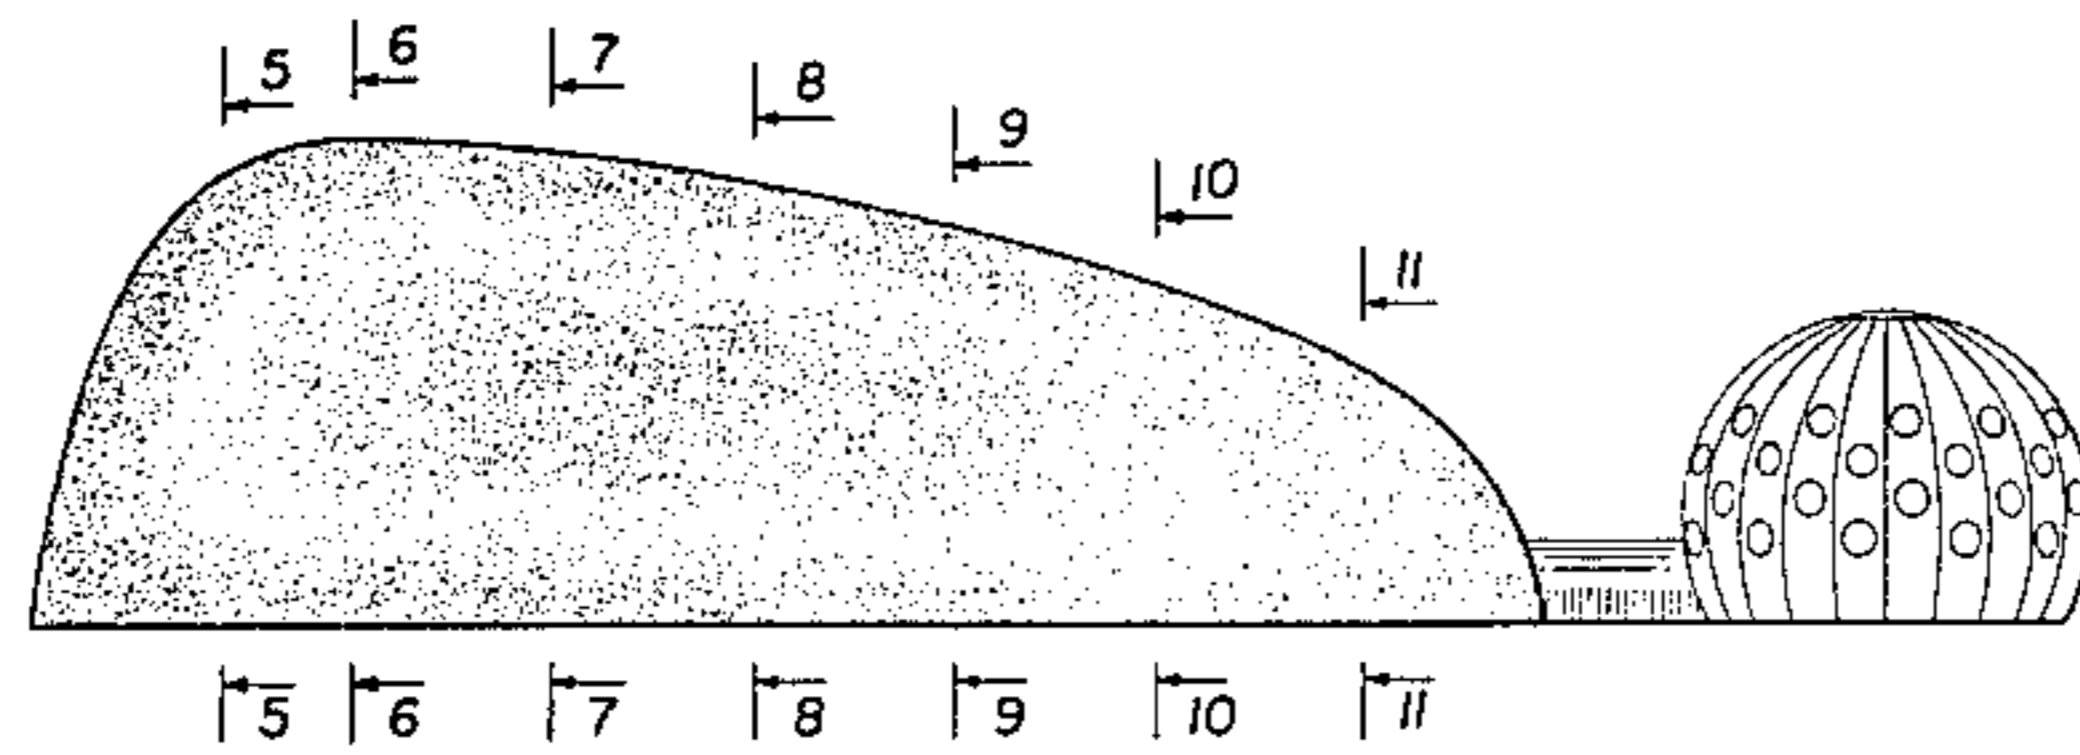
is a plan view of the air-supported structures in FIG. 1,
